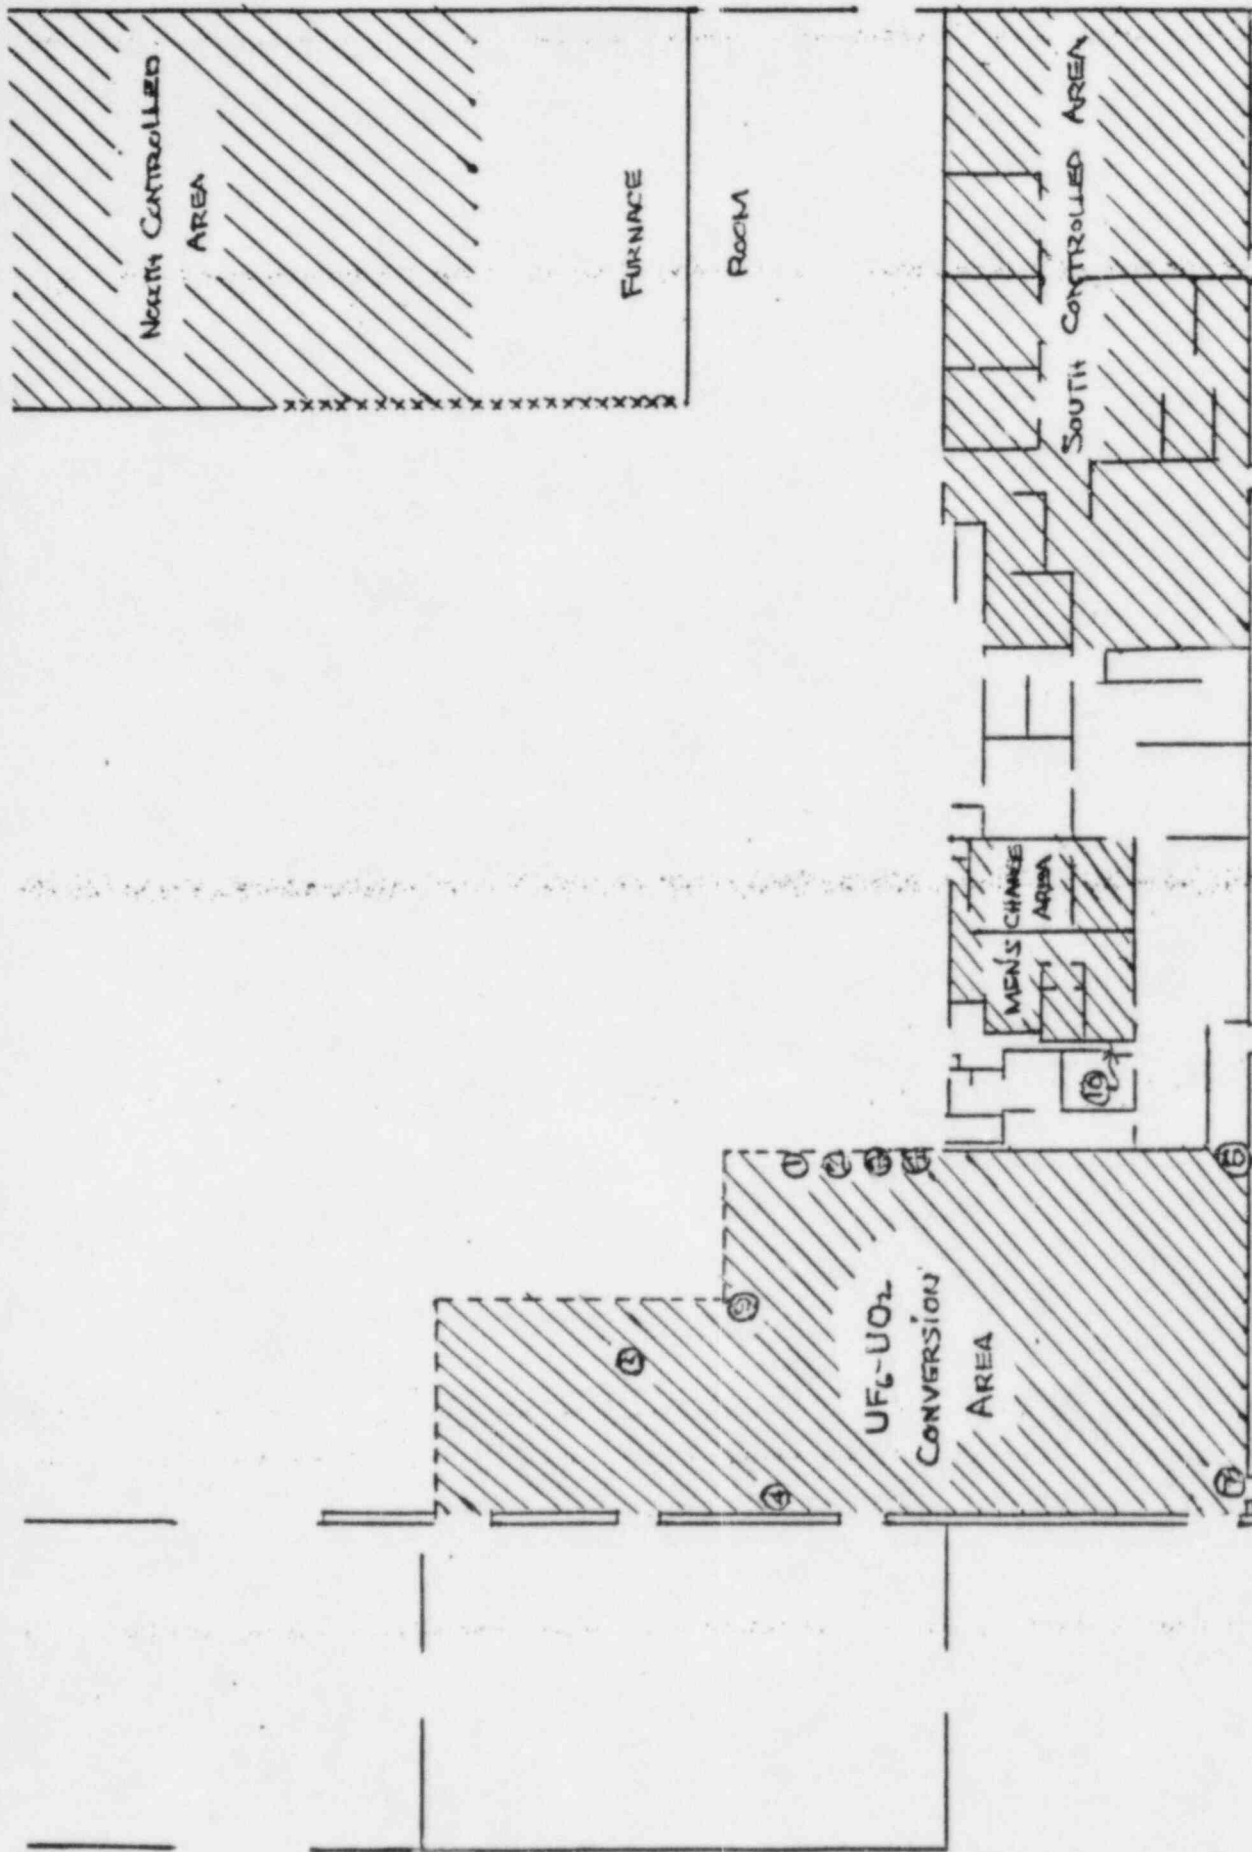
OLD SURVEY OF FLOOR AREA IN BLDG. J
